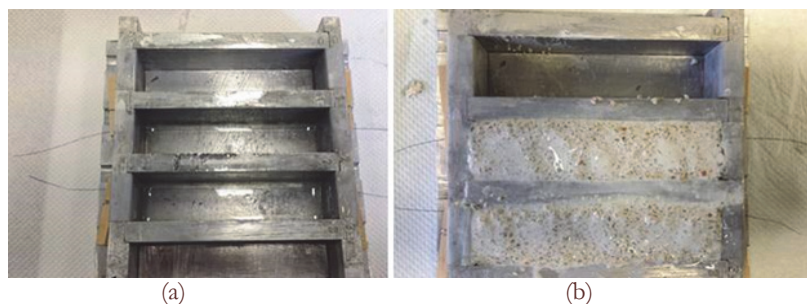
(a) Mold for the manufacturing of the prismatic specimens with already installed PVA-CNT fiber and specific oil and (b) casted mixture in the mold for two specimen's preparation.
